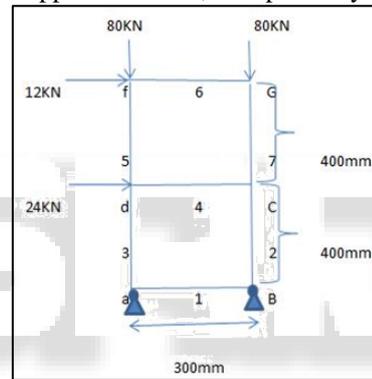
Loading pattern and pinned support condition of truss with or without bracing.
